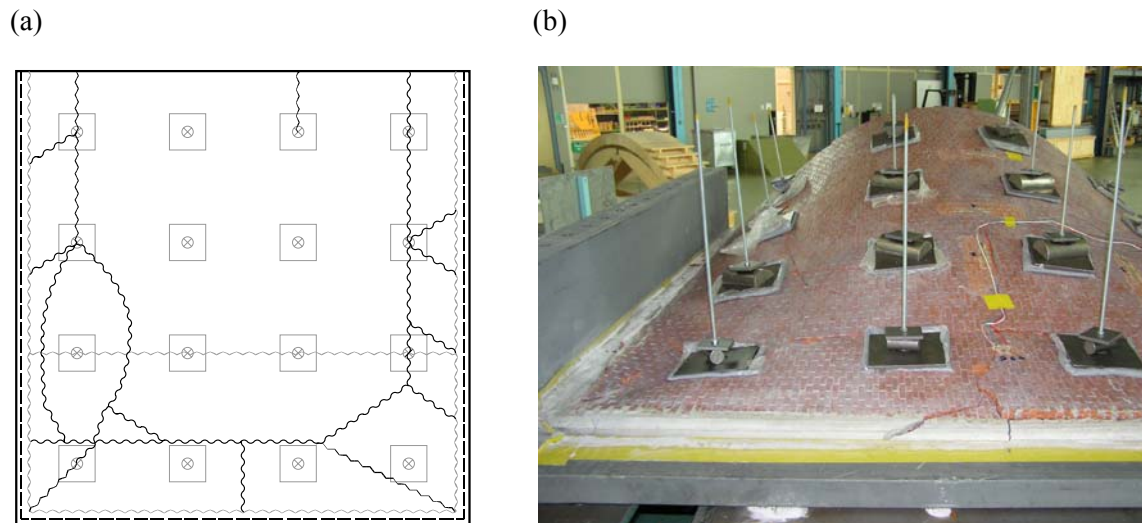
Shell Deformations: (a) Crack Pattern; (b) Failure Mechanism
